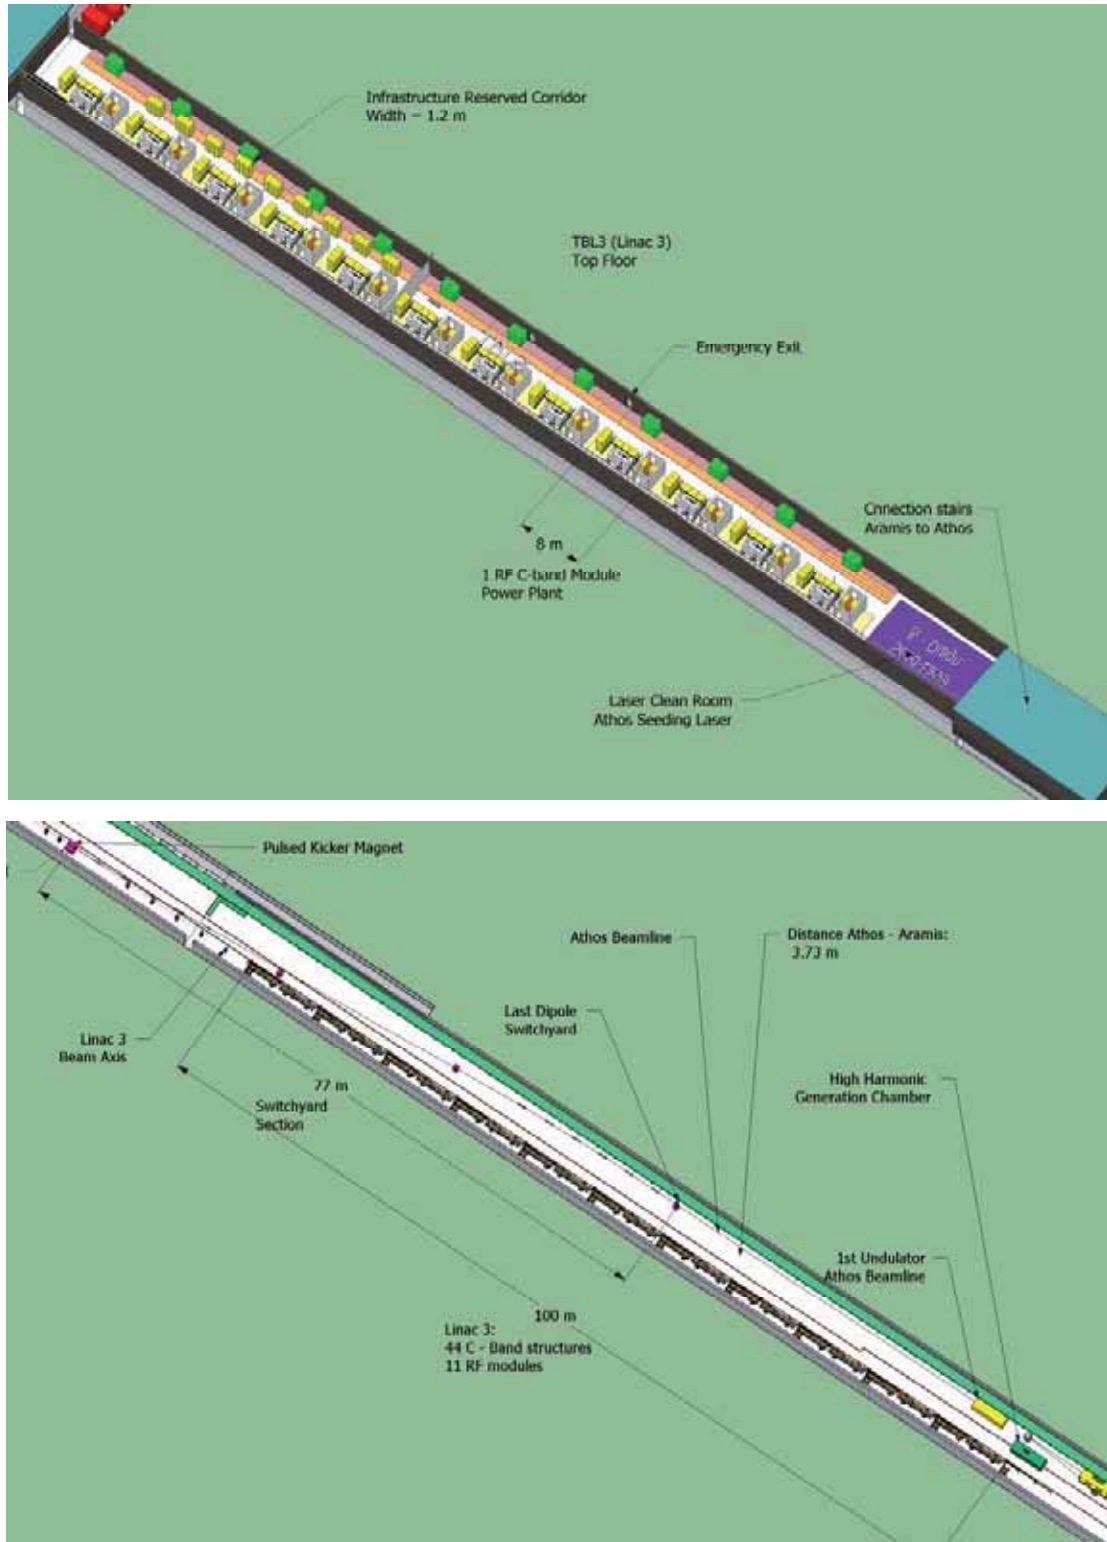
TBL3 (Technical Building Linac 3): Linac 3 towards Aramis and Switchyard towards Athos beamline. Top: Upper level TBL3; Bottom: Lower level TBL3
